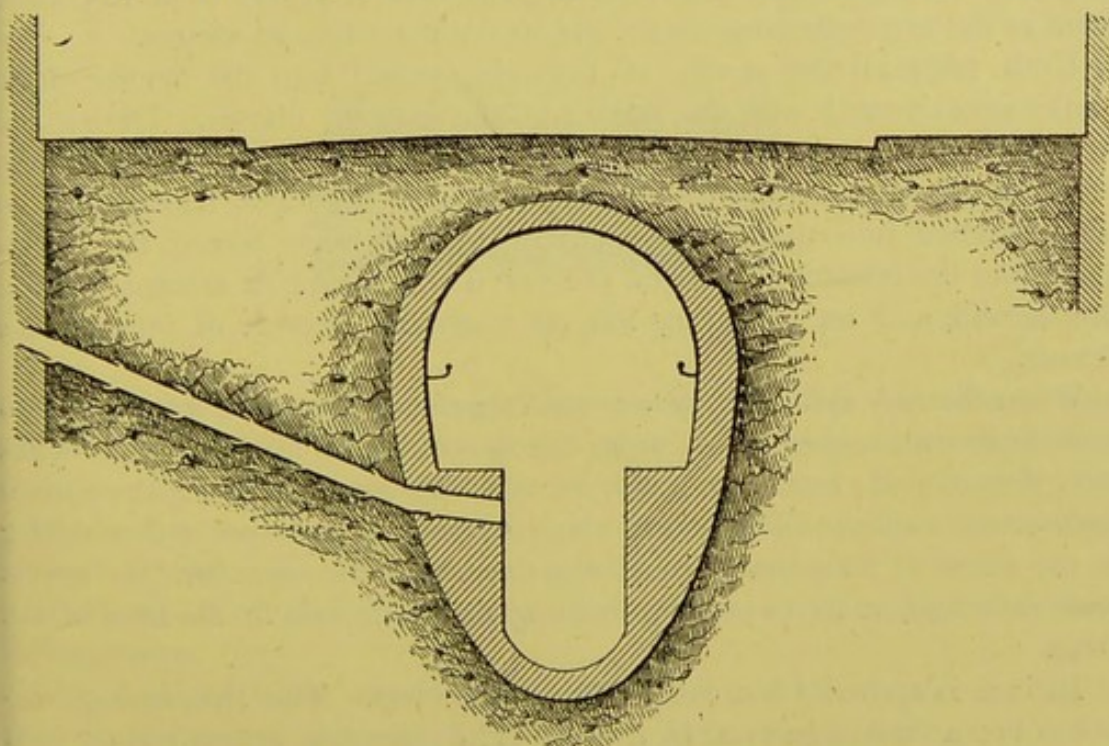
COLLECTING SEWER FROM THE LEFT.
